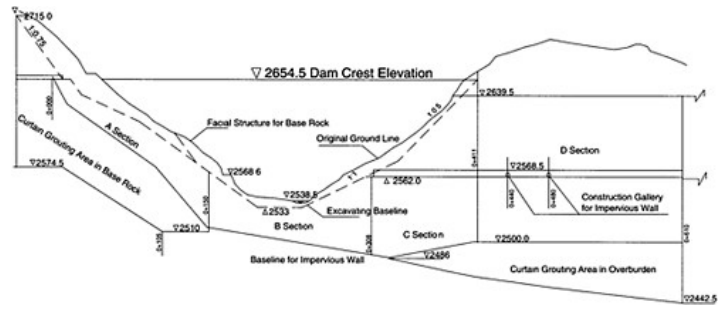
Layout of Antiseepage System of Foundation for Yele Hydropower Station Dam.
